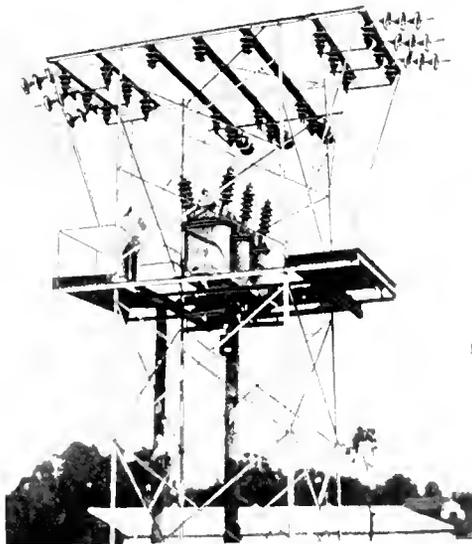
44,000-Volt Switching Tower at Mooresville, N. C.
